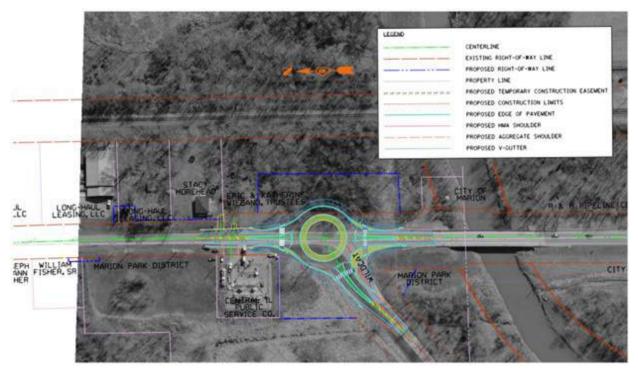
Plan view of proposed Court and Wildcat Roundabout
